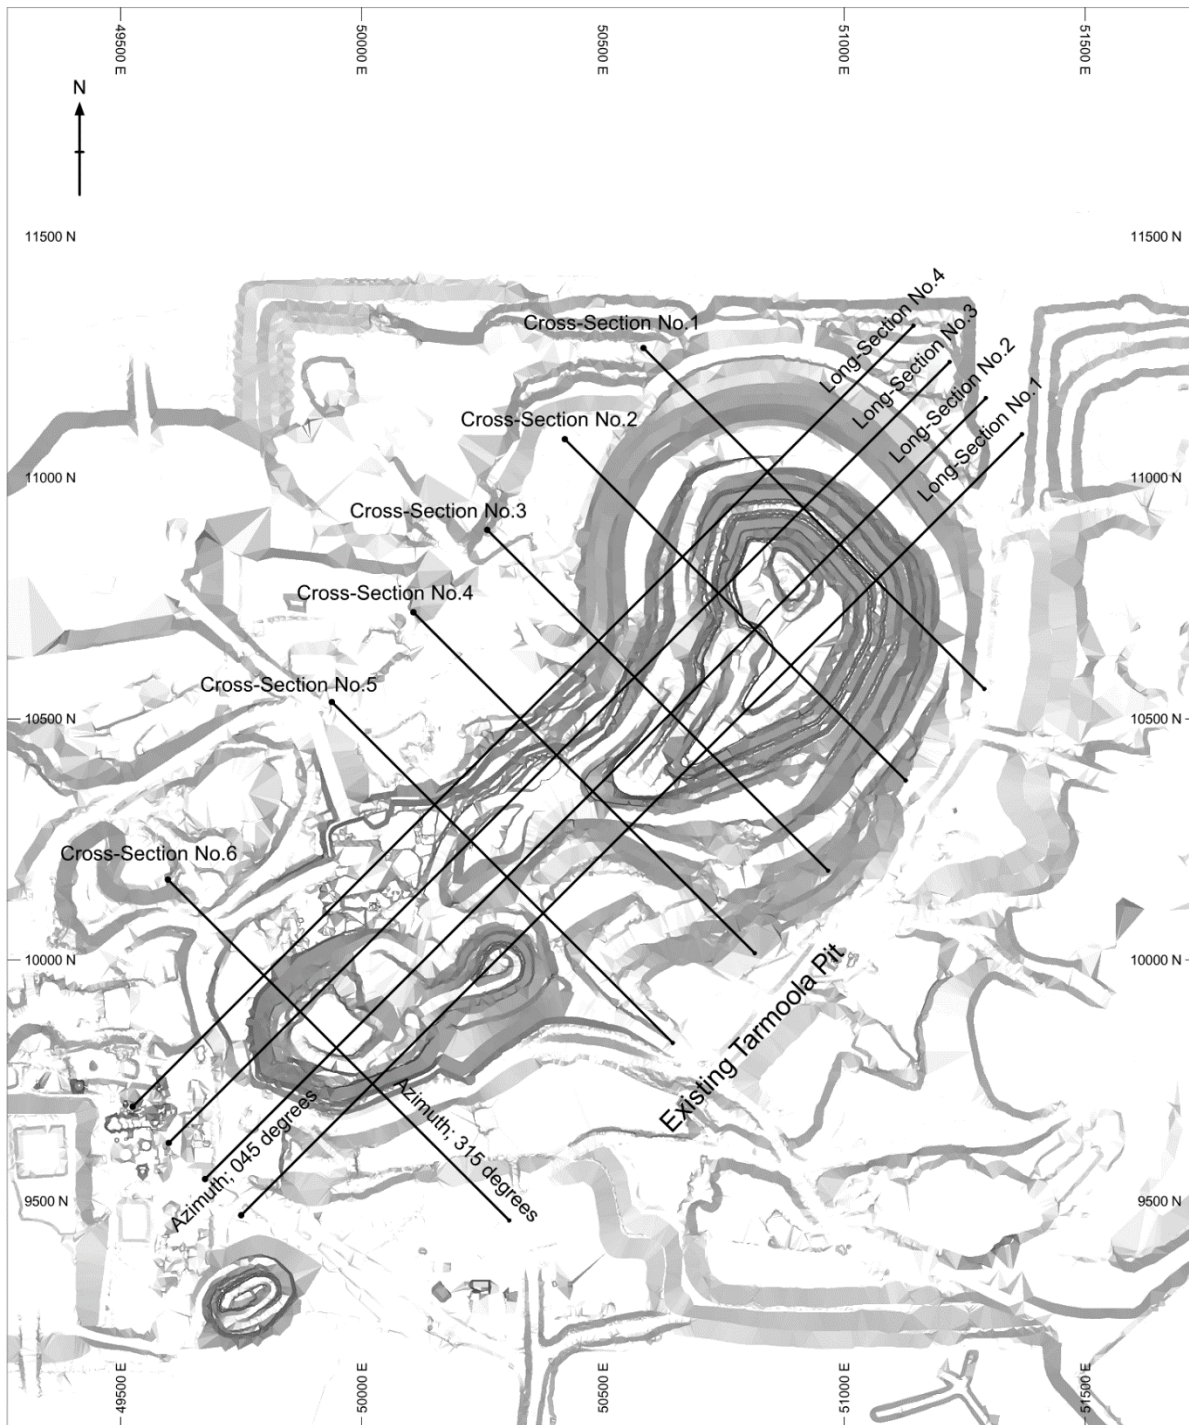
Photo Planview of the KOTH pit show the position of the cross sections no 1 to 6 and long sections no 1 to 4 in the following figures.
